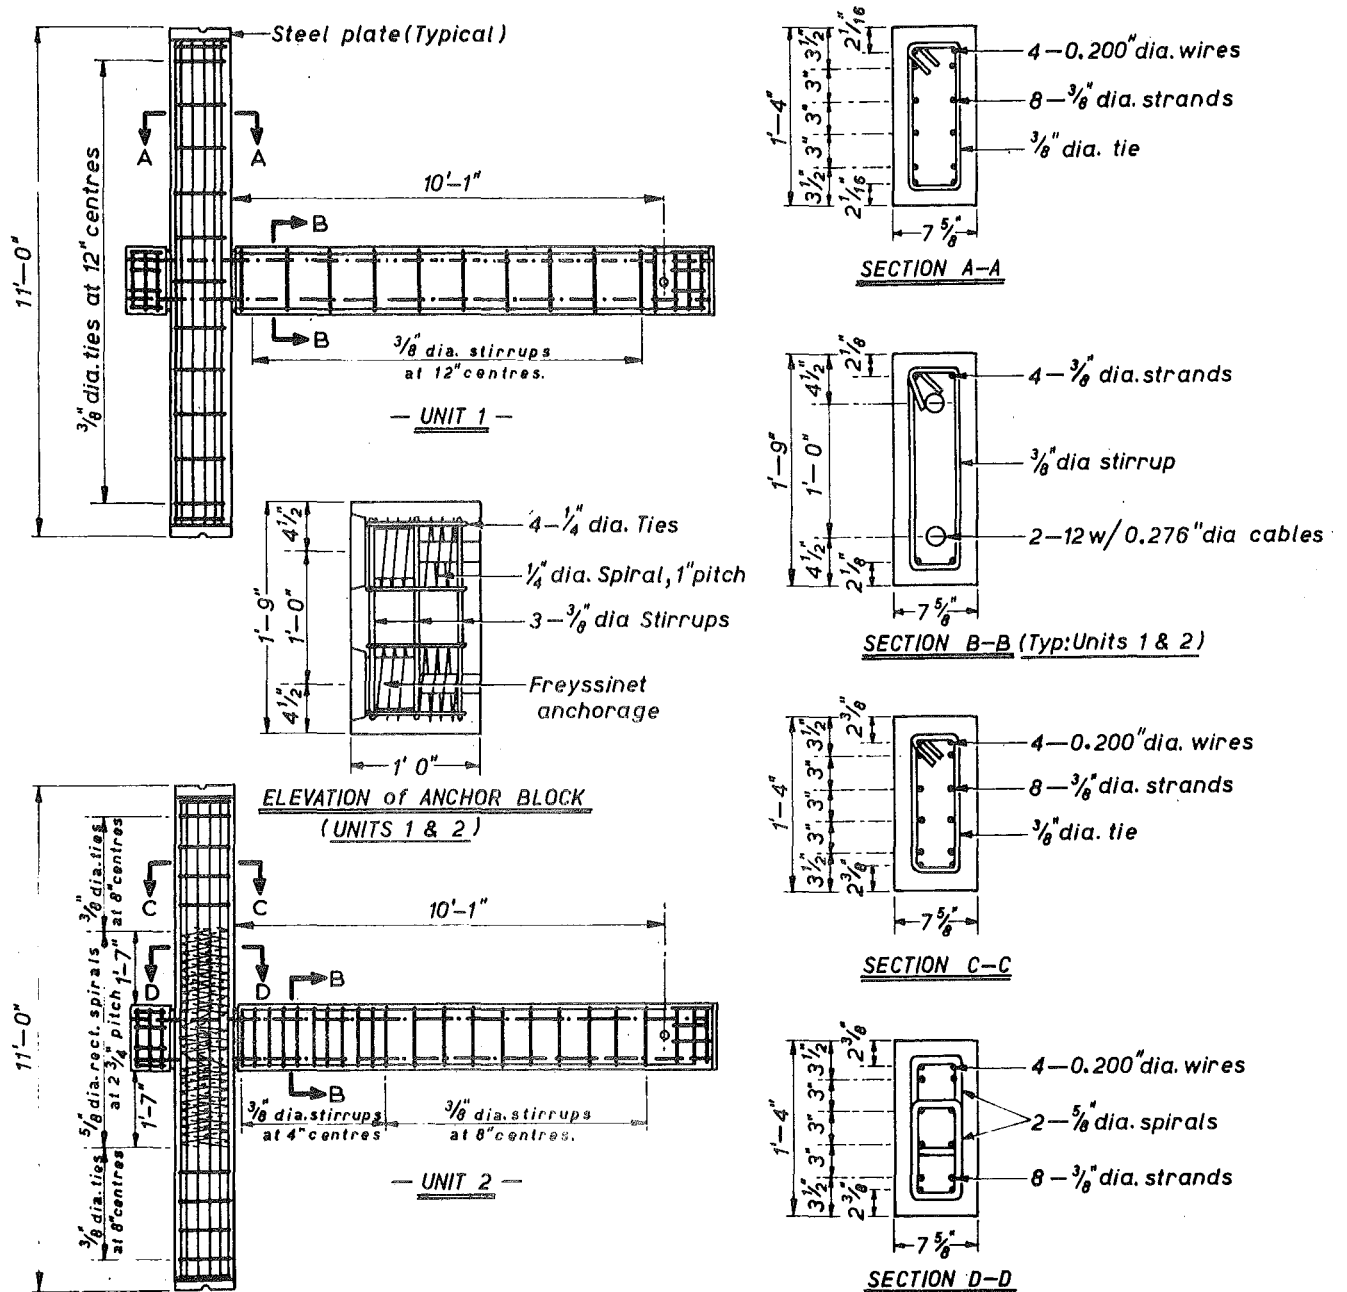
DETAILS OF UNITS 1 AND 2.
